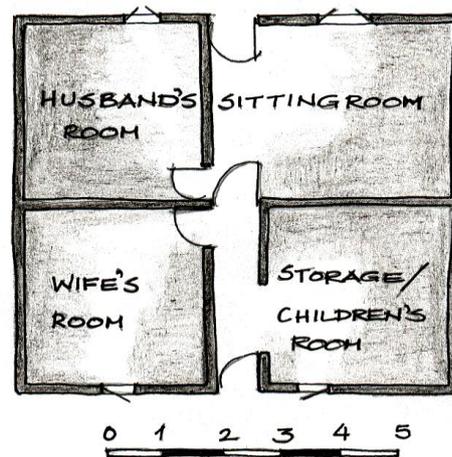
Floor plan of the Square Four-room house. Mbuya.
